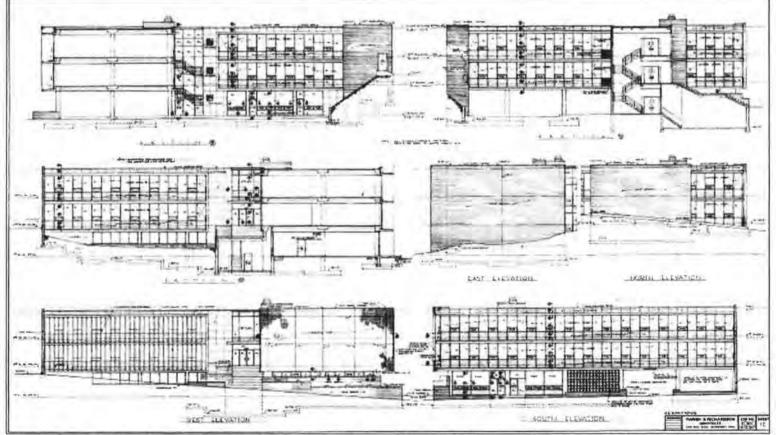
Elevations, interior courtyard (top, west to left, south to right); west façade (center, left); east and north end walls (center, right), and west and south facades (bottom, west to left, south at right) (Original architect's drawings, 1957 in the owner's archives)
